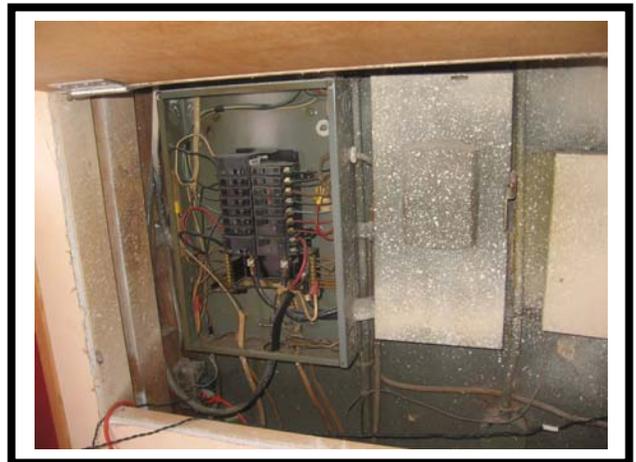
Both panels have breakers oversized for wires, unsealed openings and ground/neutral wires mixed. Safety issue.
